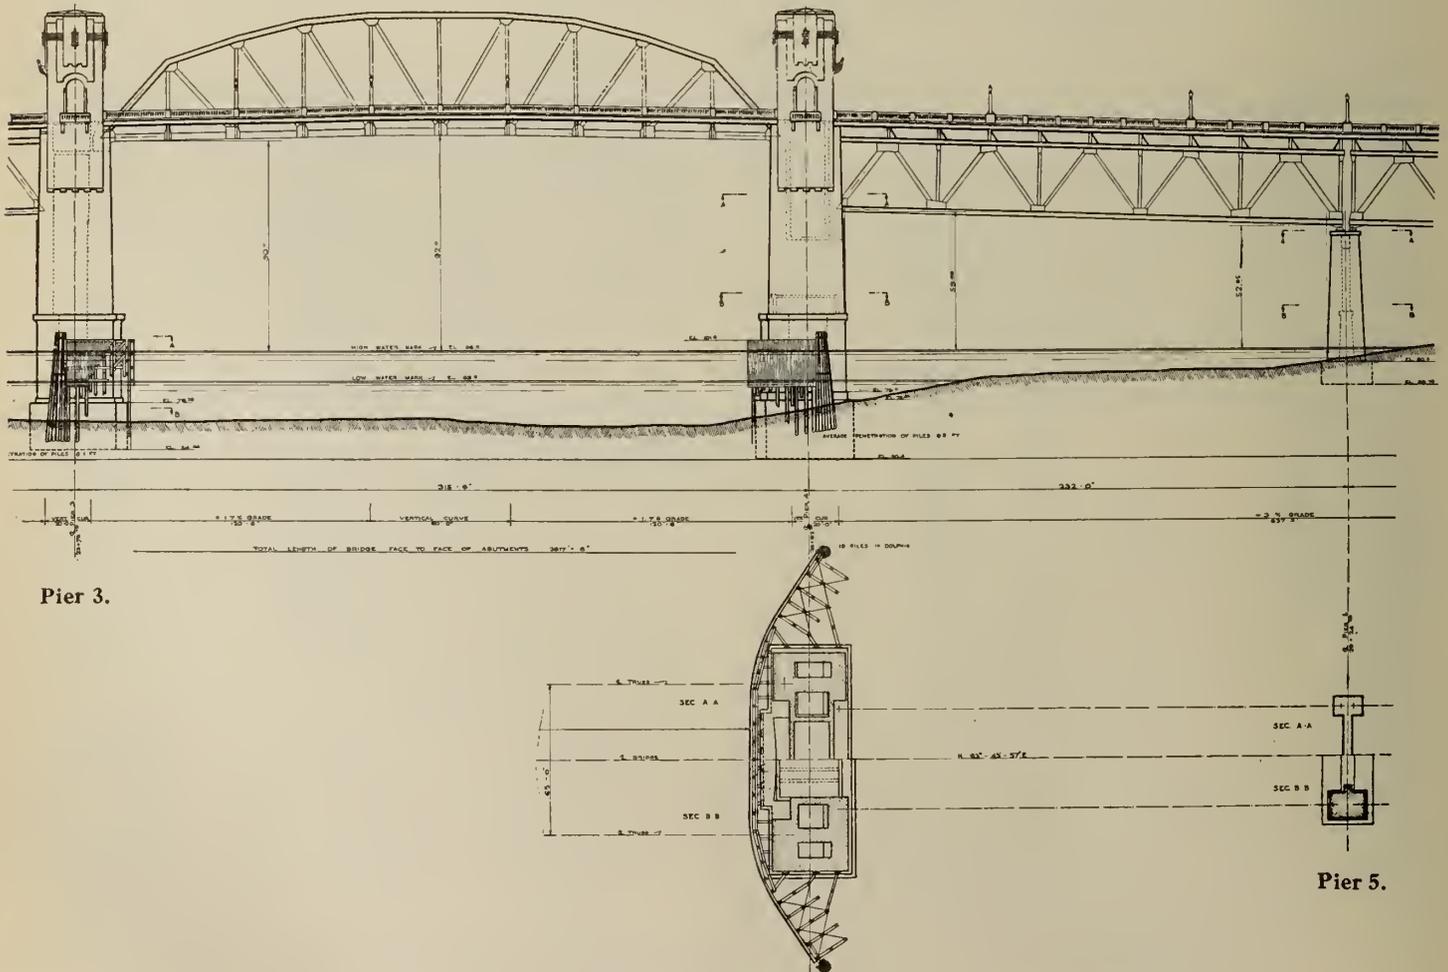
Main Piers 3, 4 and 5 and Steelwork.
